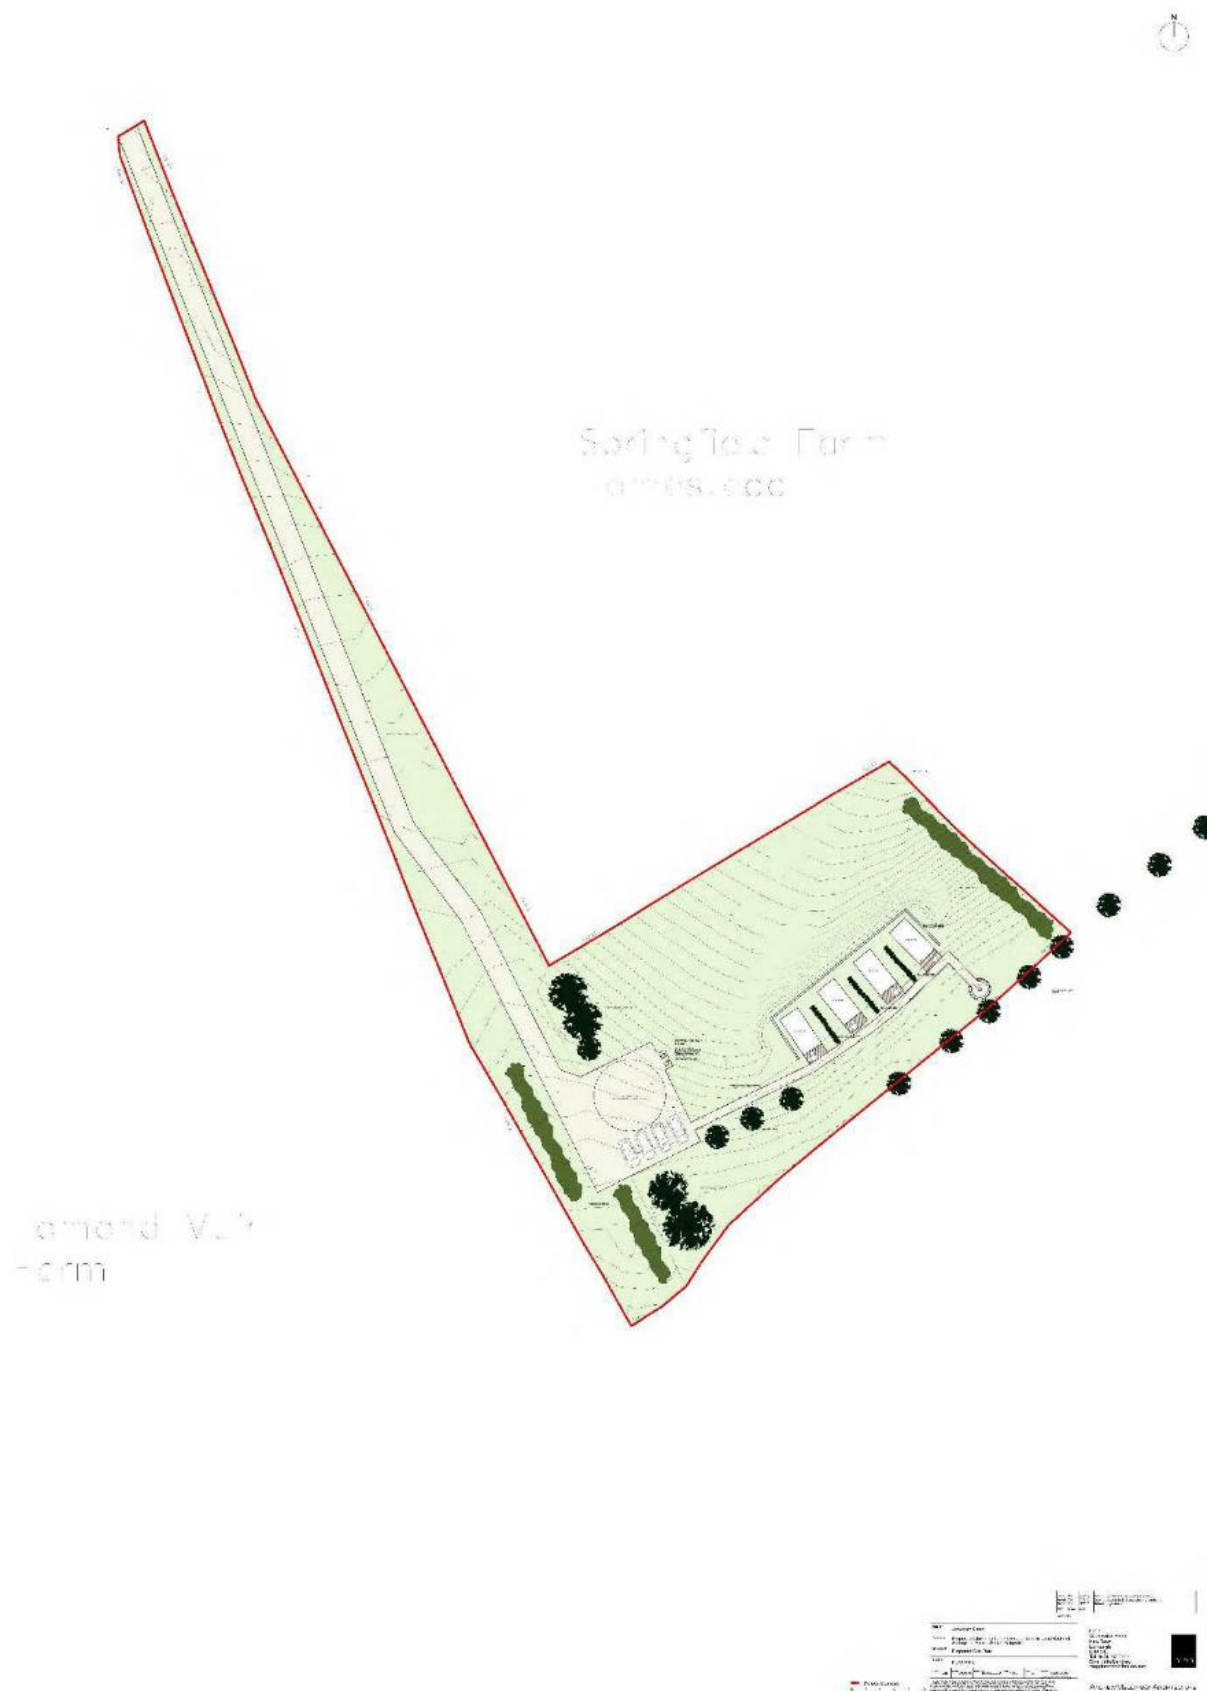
Proposed site plan for Lomondmuir Farm Cabins that was approved
